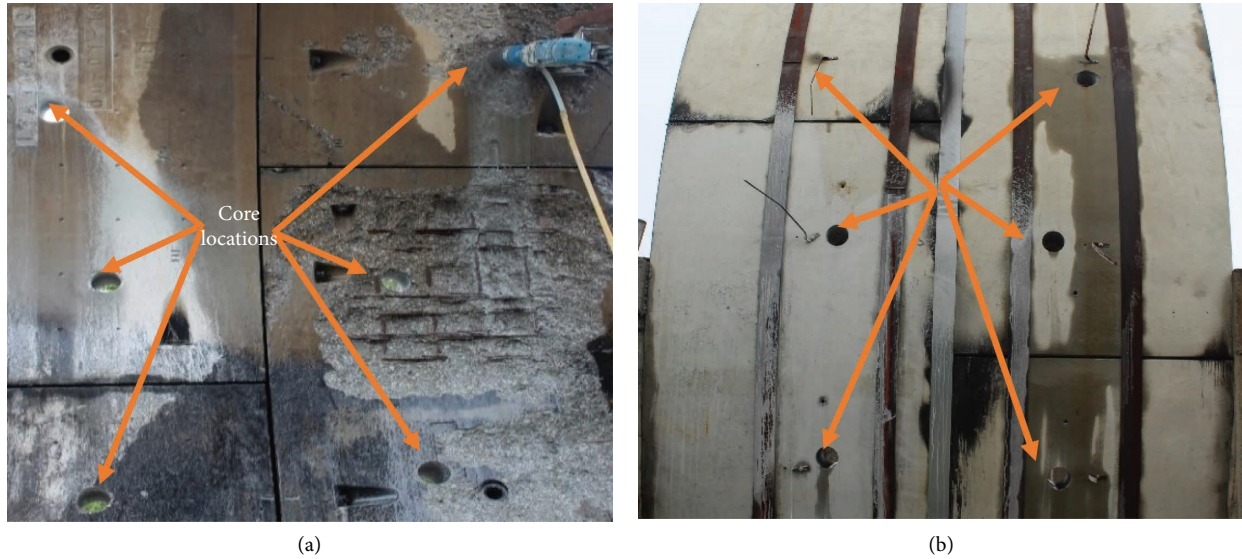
Coring drill locations in the full-scale segments for MYC and SPC concrete tunnels; (a) inner surface view and (b) outer surface view.
